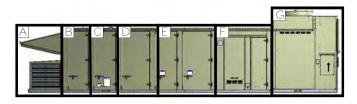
60 to 75 ton — left view of sample configuration (inches)
